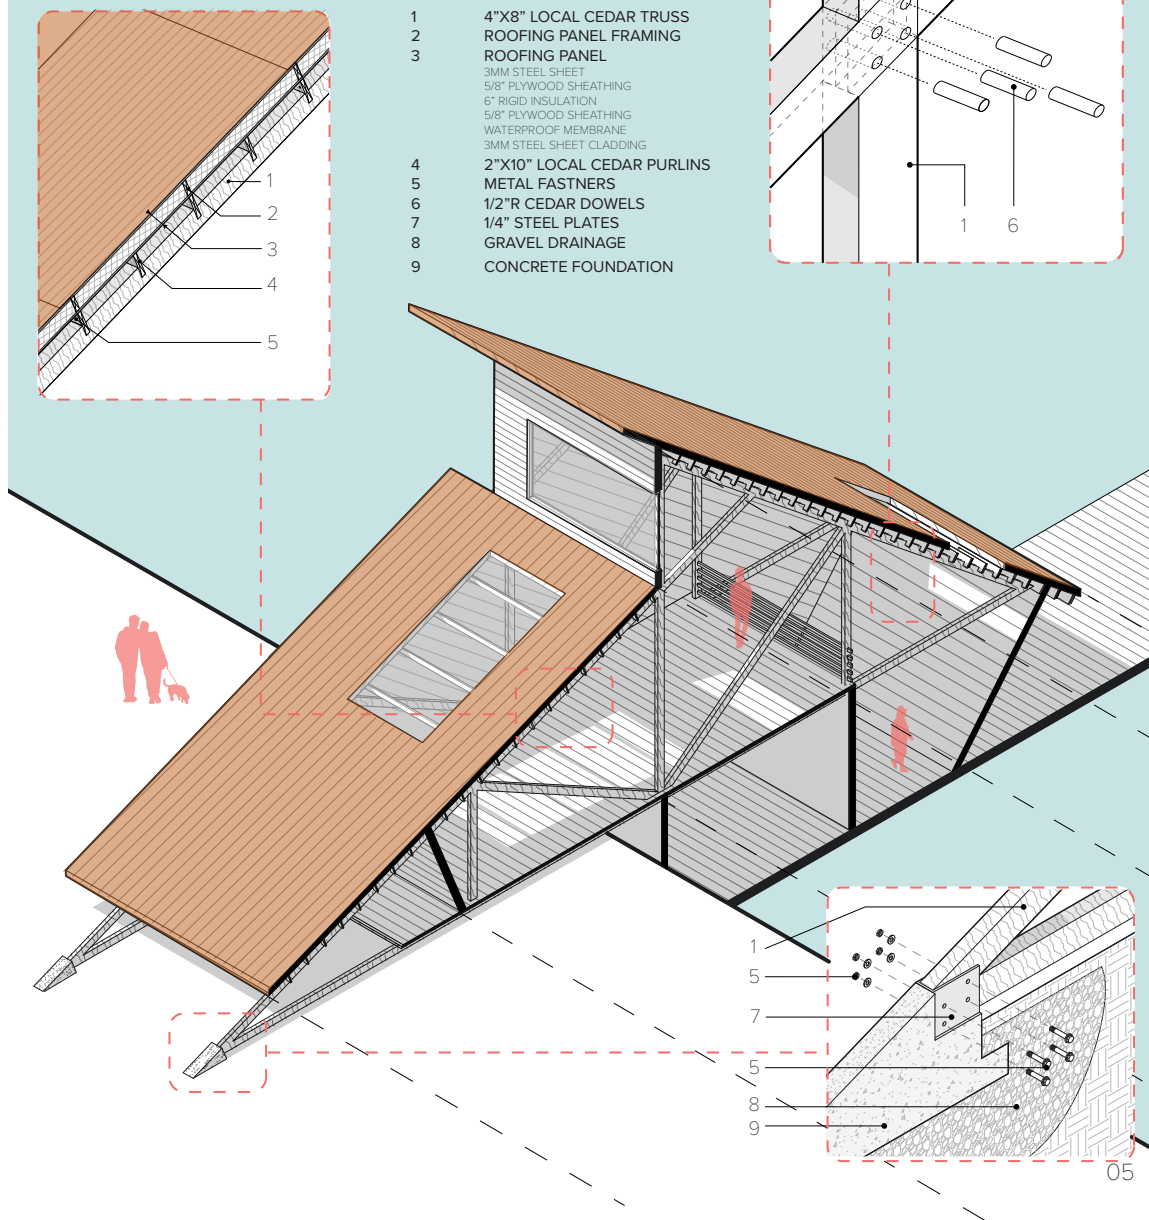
Axonometric and details of the heavy truss construction system which reduces the buildings embodied carbon footprint by over 77%.
